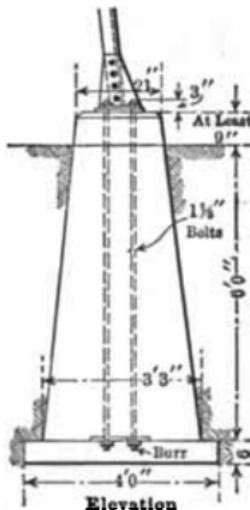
Flexible tower. FIG. 59.—Concrete anchor for steel tower.
